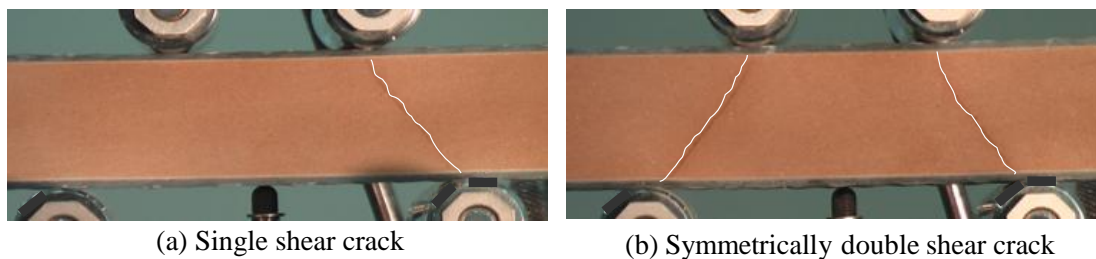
Typical static failure modes in Eco-Core sandwich beam (Crack is highlighted by white line).
